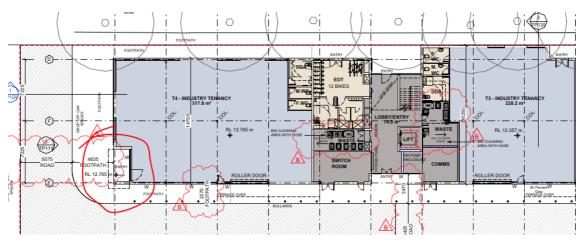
Location of entry to T4, Source: North East Plot Proposed Ground Floor Plan TP100 Rev B by Six Degrees Pty Ltd
